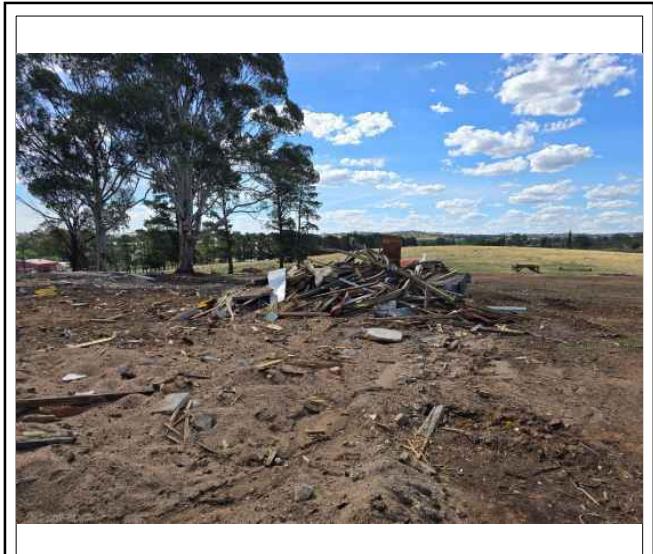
Footprint of demolished Shed 3 looking south with C&D waste (concrete) and former UST in centre picture.
